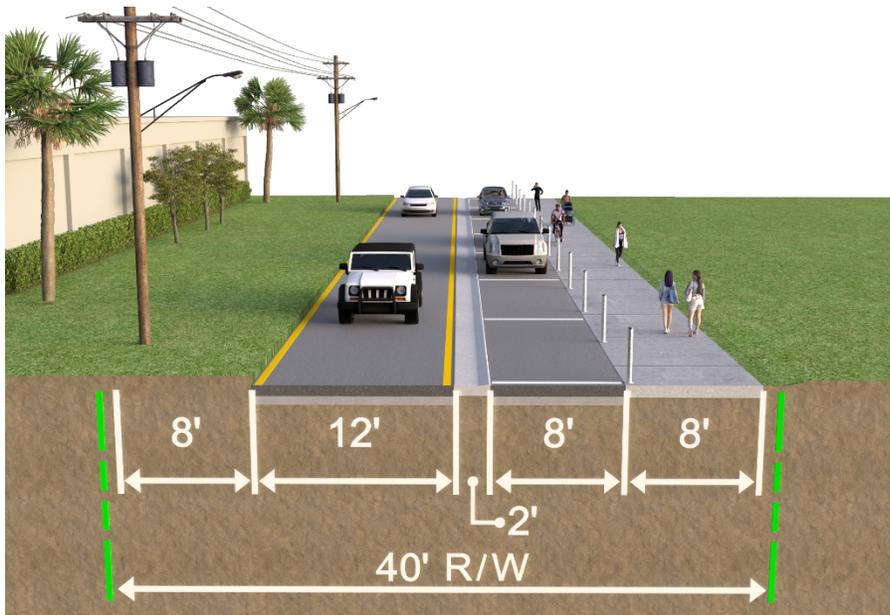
| Side Street One-Way Section With Parking Alt 1
